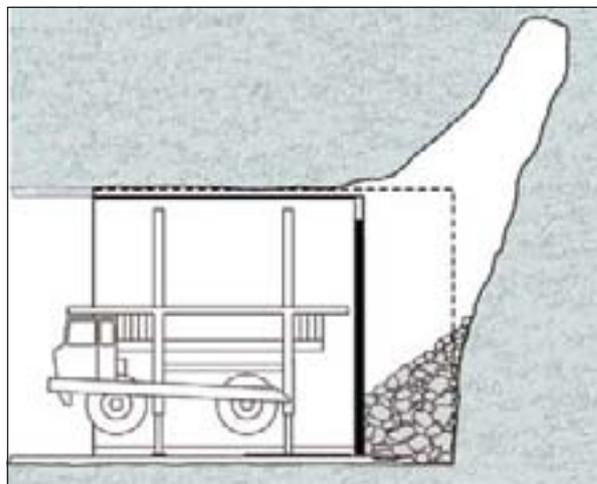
Principal drawing that shows a solution of the blocking of rock fall in the Ellingsøy tunnel.
